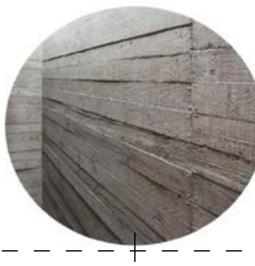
BU: Concrete (Aedo, 2014: online)
